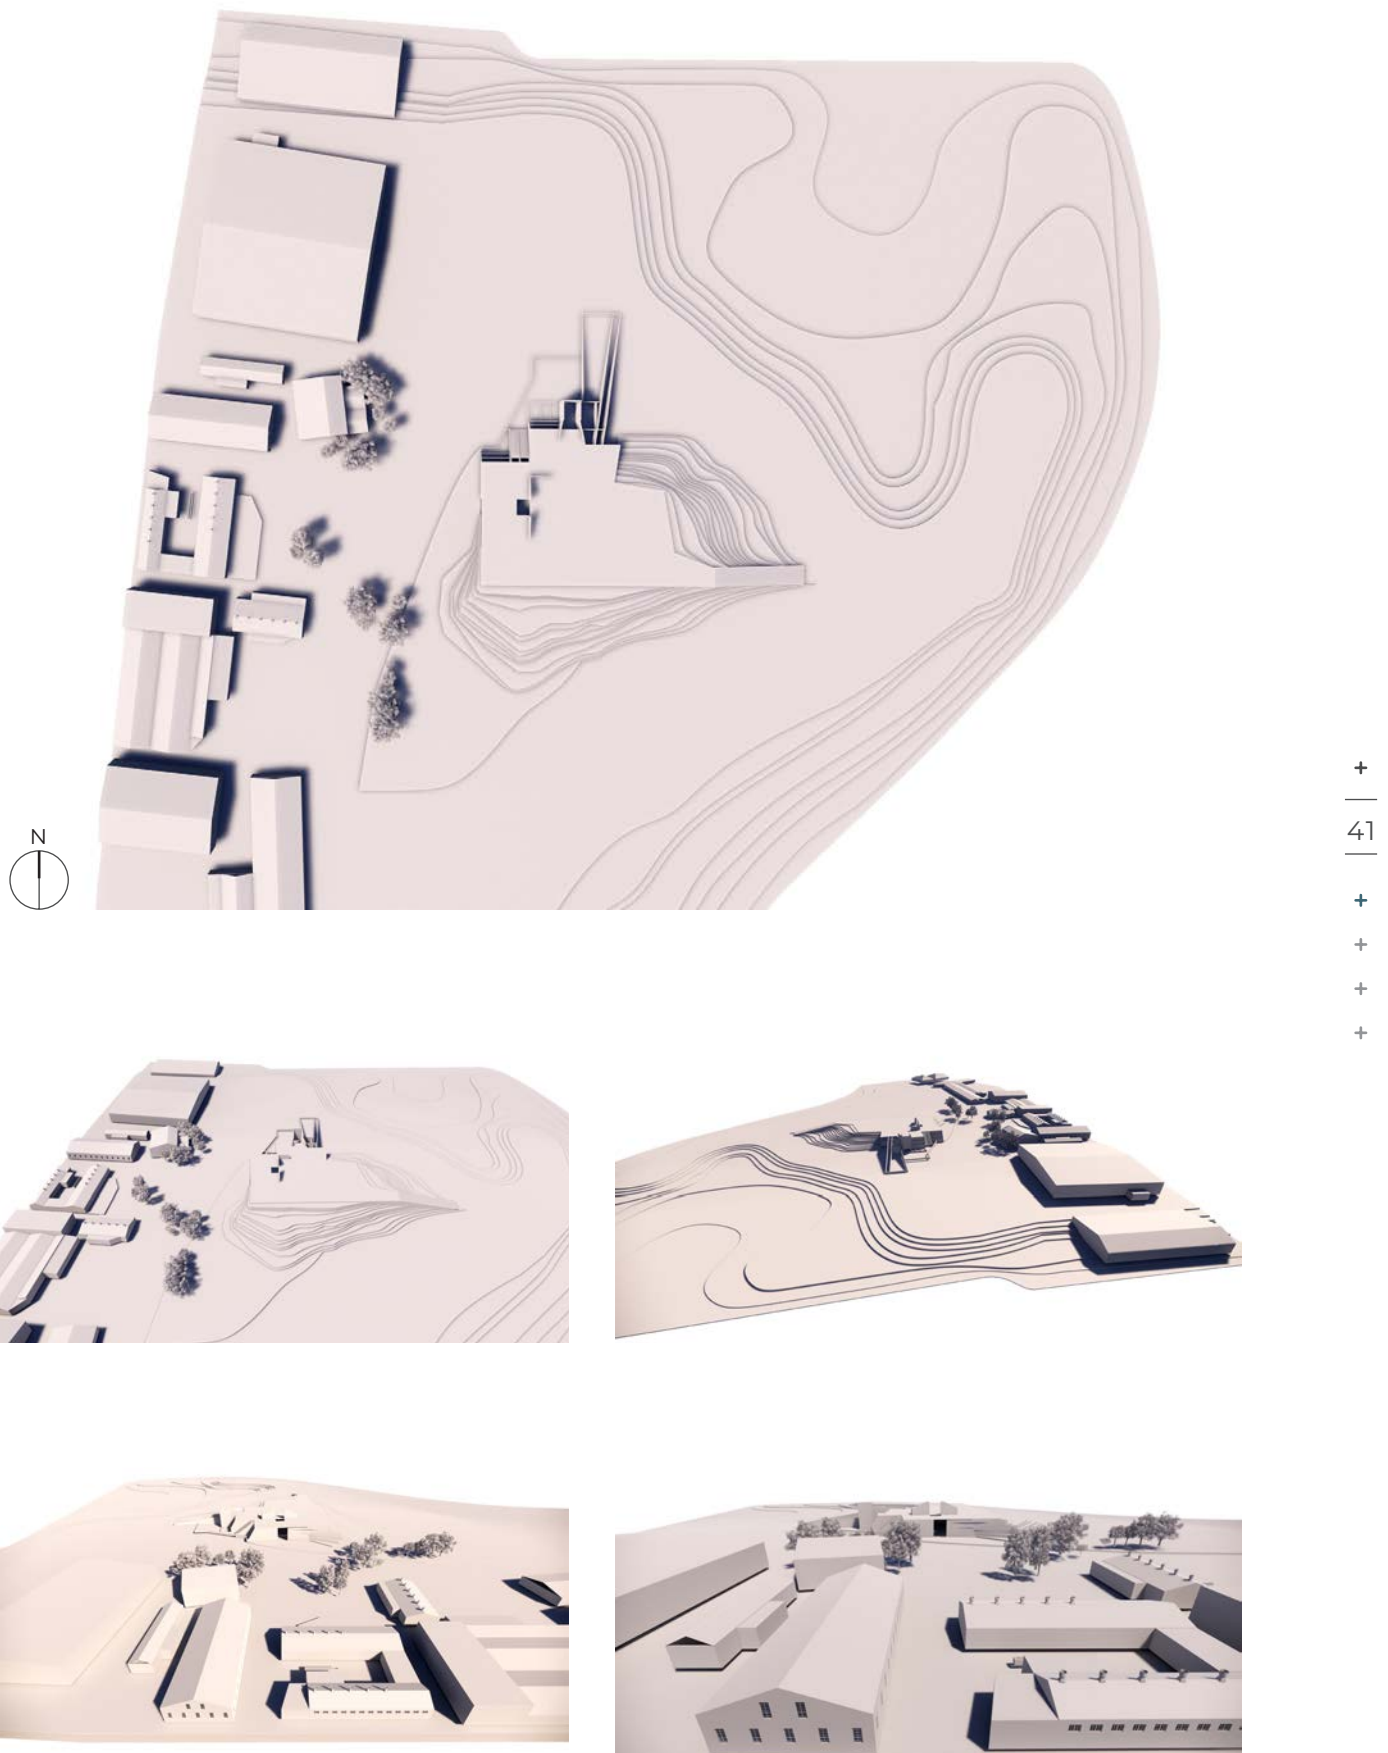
Views of the site and built fabric today (Author:2018)
